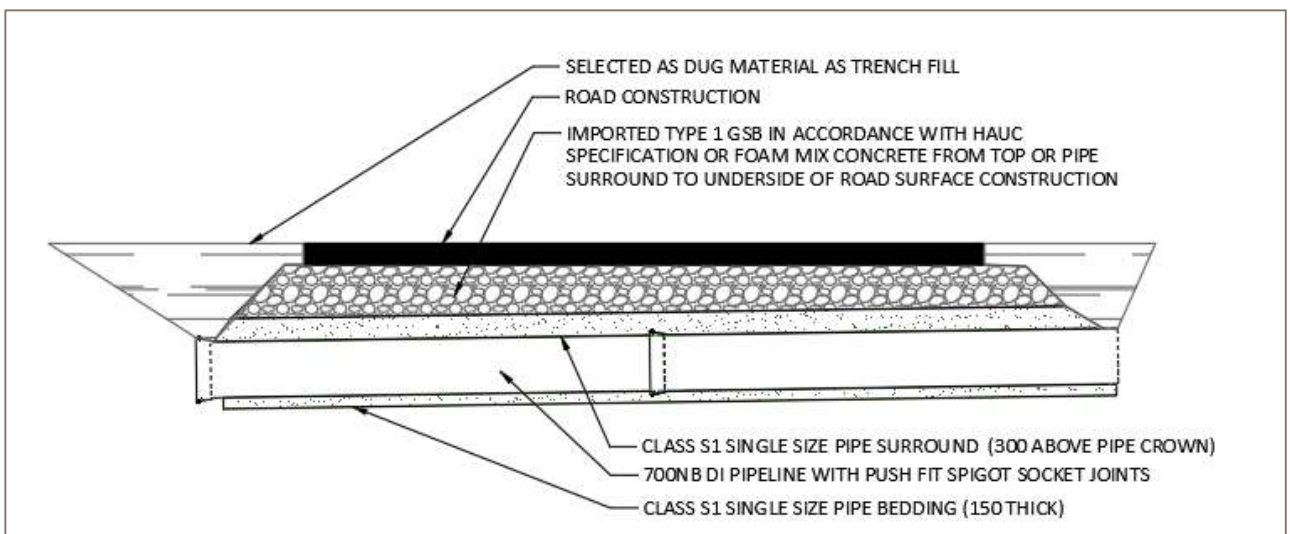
Open Cut Road Crossing Typical Arrangement
